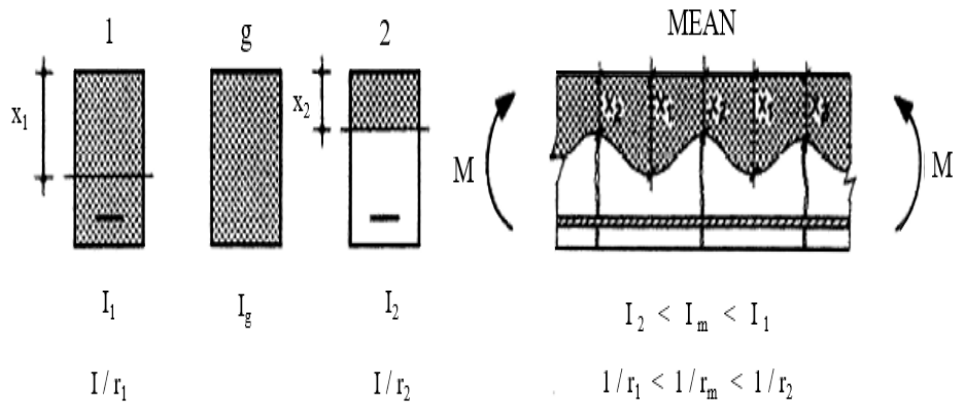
Cracked, uncracked and effective behavior of reinforced concrete sections (Cosenza E., 1990).
